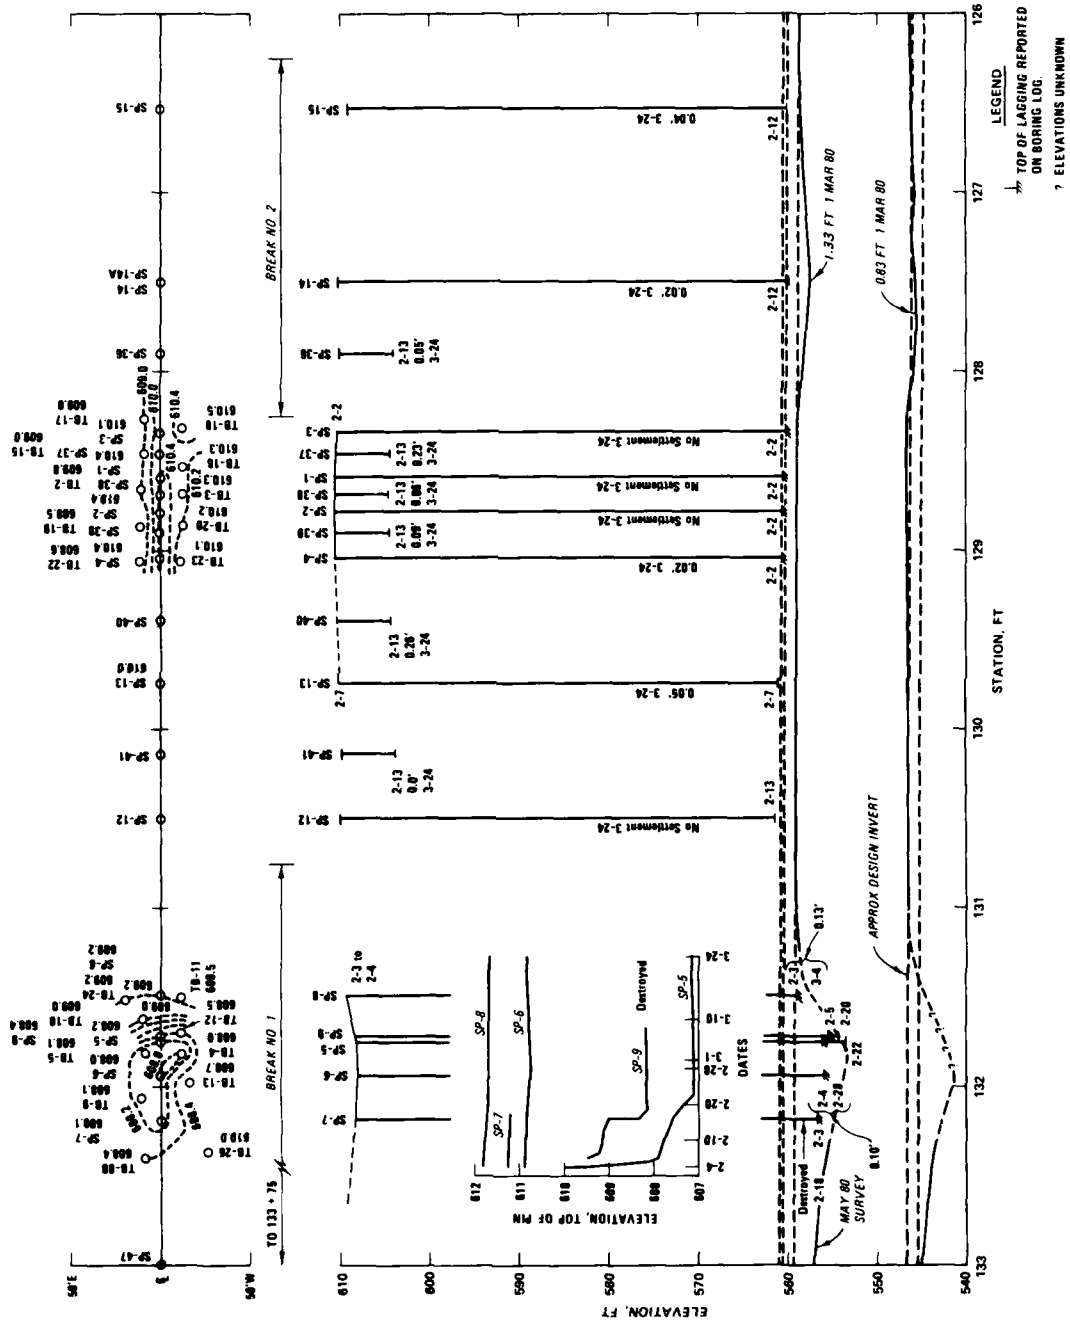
Settlement pin observations, Distressed Areas 1 and 2, 15 Mile Road/Edison Corridor Tunnel Failure Study
